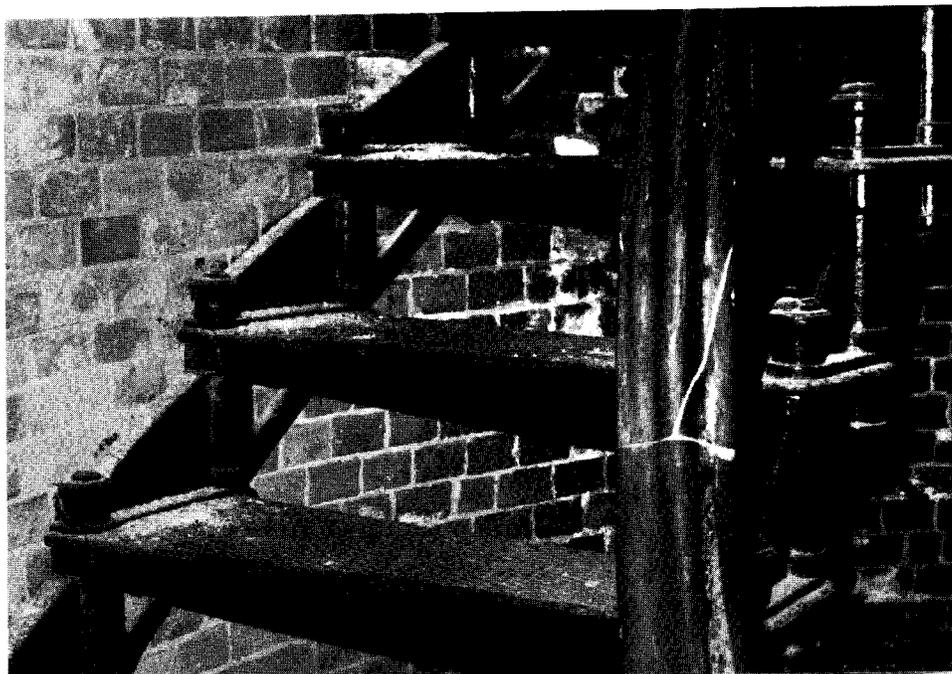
Room 112, curved stair installed in 1903, First Level of Tower.
